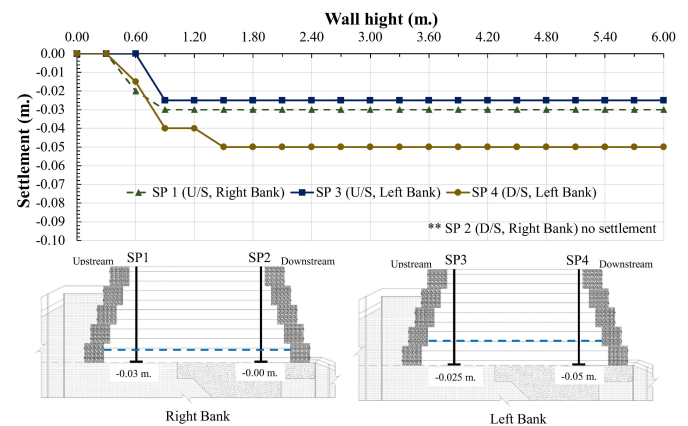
Vertical displacement of foundation of new dam crest (Settlement Plate)
